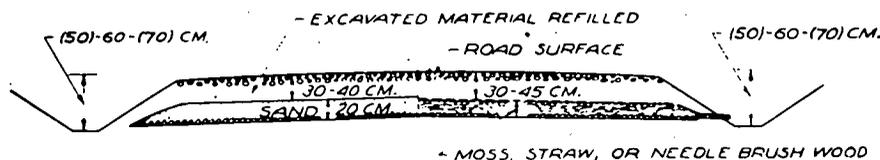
Insulation against Frost Damage. Figure shows excavation filled with original frost-heaving soil above the insulation layer. This is cheap construction and satisfactory for gravel roads of minor importance. On more important highways where a bituminous surface is used, a more satisfactory soil or a stone foundation is used above the insulation layer.
